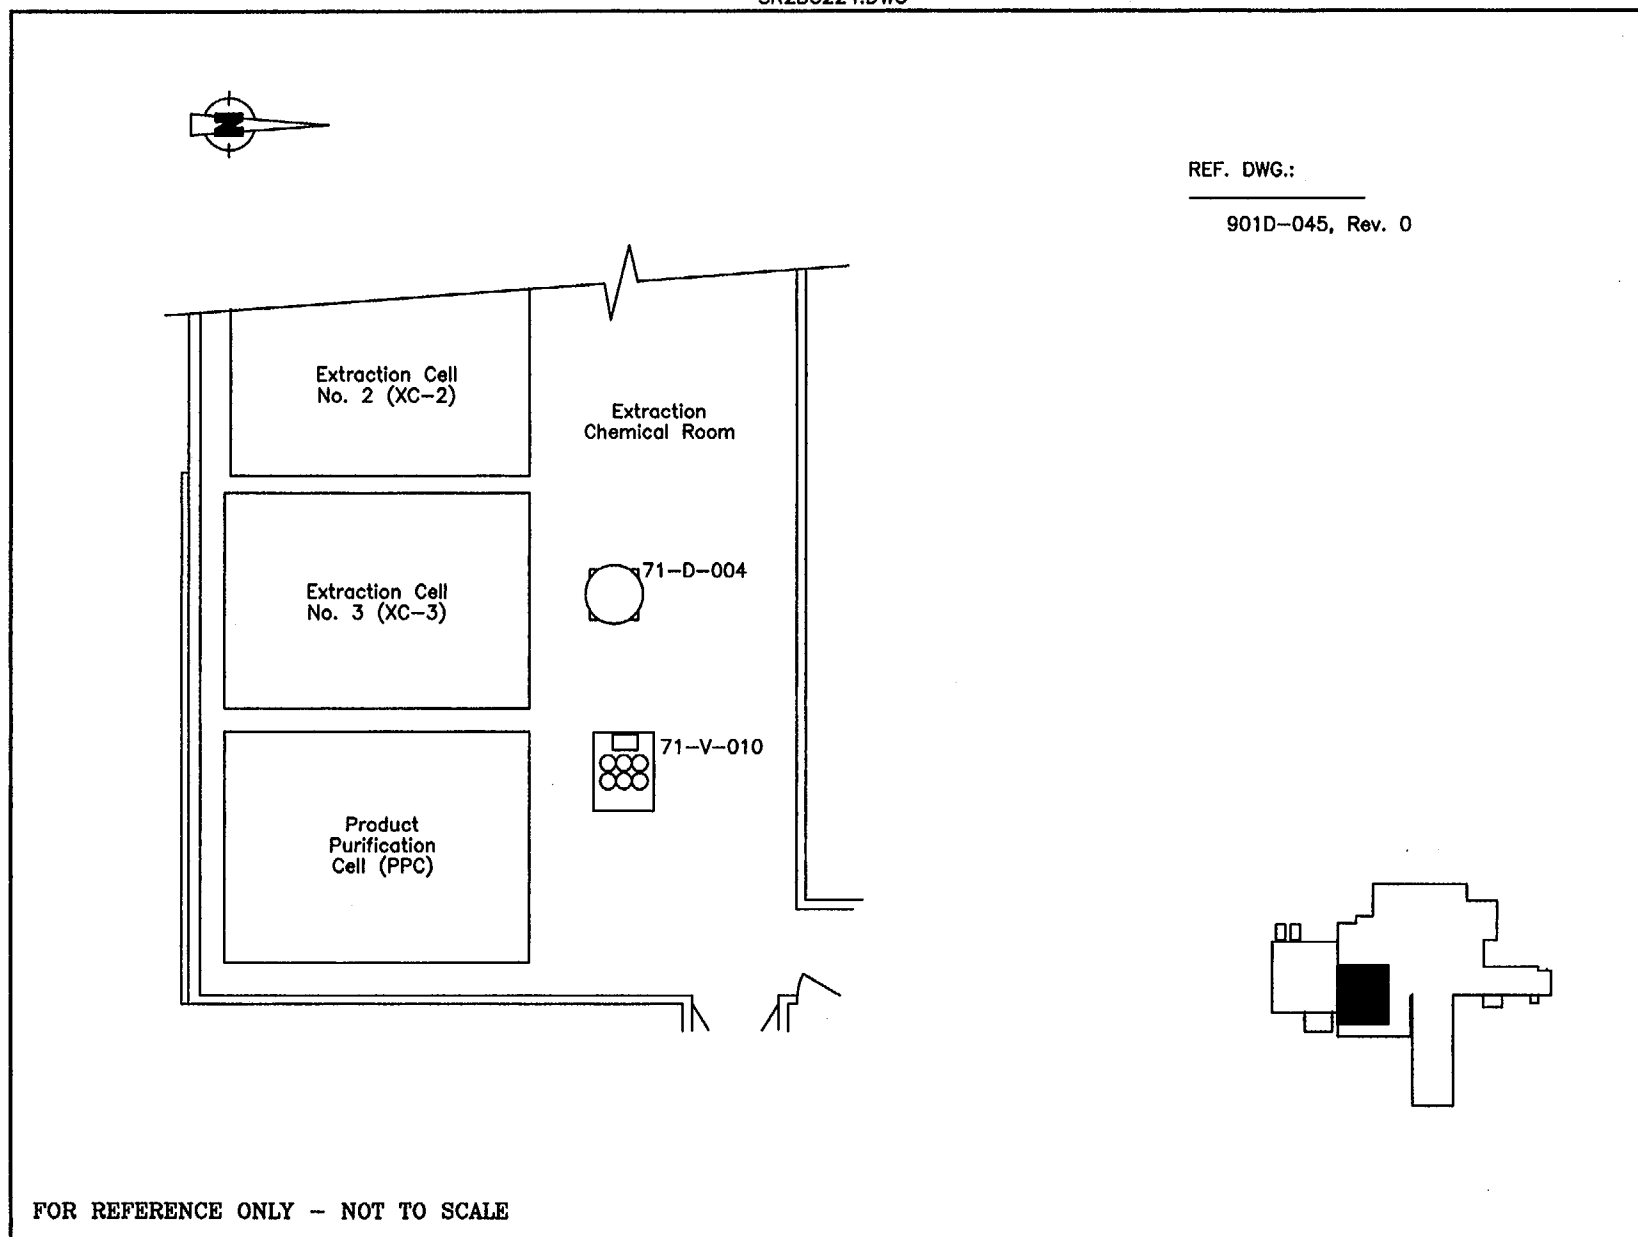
LWTS Plan at Elevation 160.0'
